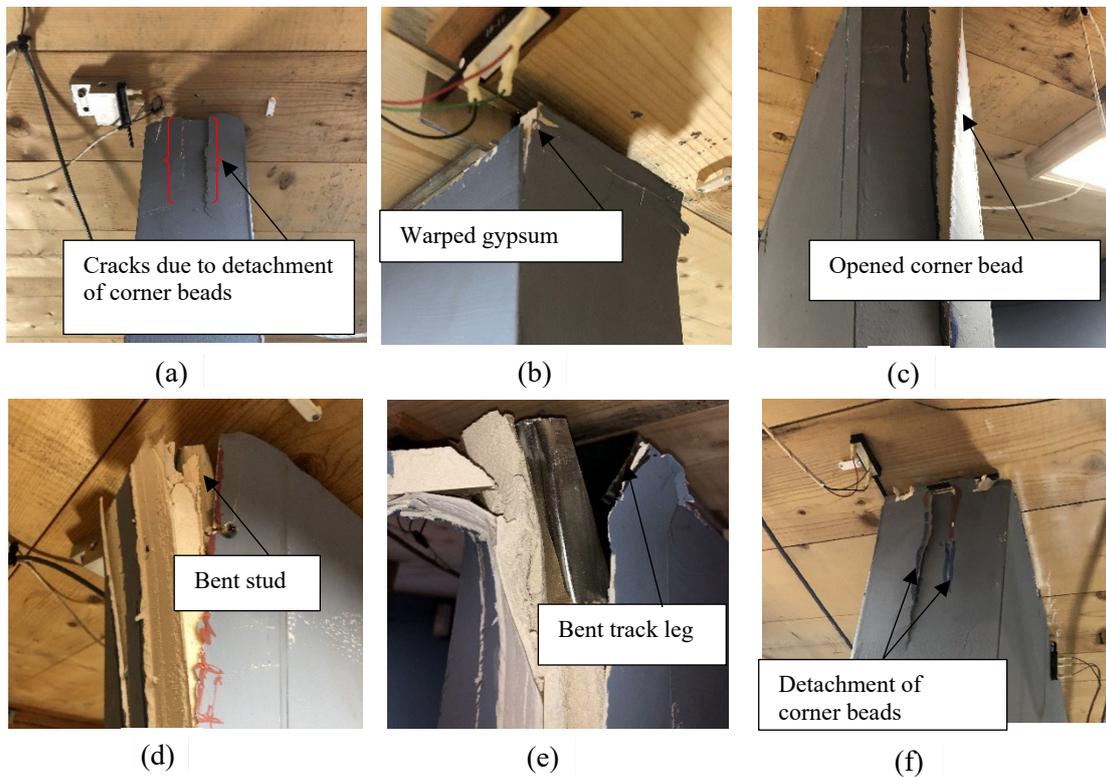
Phase 1 observations: (a) Light detachment of corner bead at wall ends (0.46% drift, slip track); (b) light warping of drywall (0.67% drift, slip track); (c) significant opening in the corner bead (0.84% drift, slip track); (d) end stud bending (2.56% drift, slip track); (e) track leg bent (3.2% drift, slip track); (f) light detachment of corner bead at wall ends (5% drift, telescoping)
